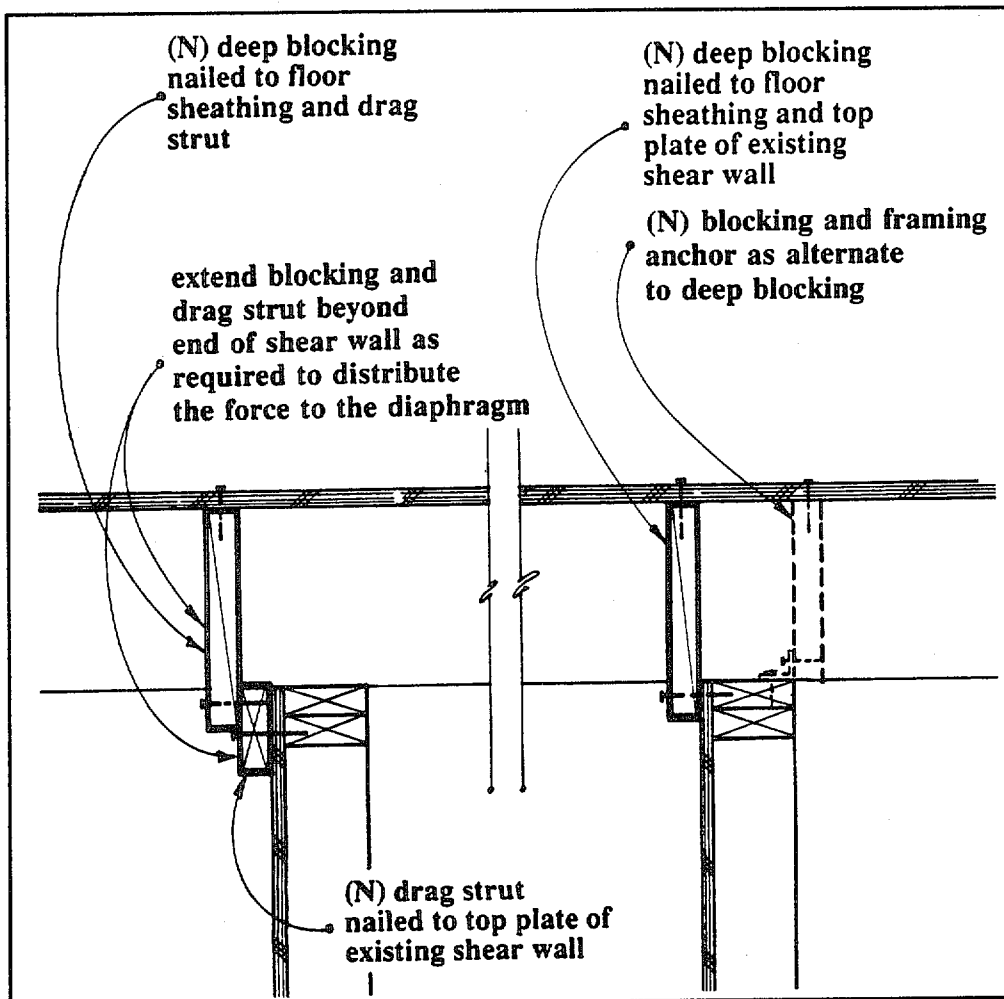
Strengthening the connection of a diaphragm to an interior shear wall (wall perpendicular to floor joist).
